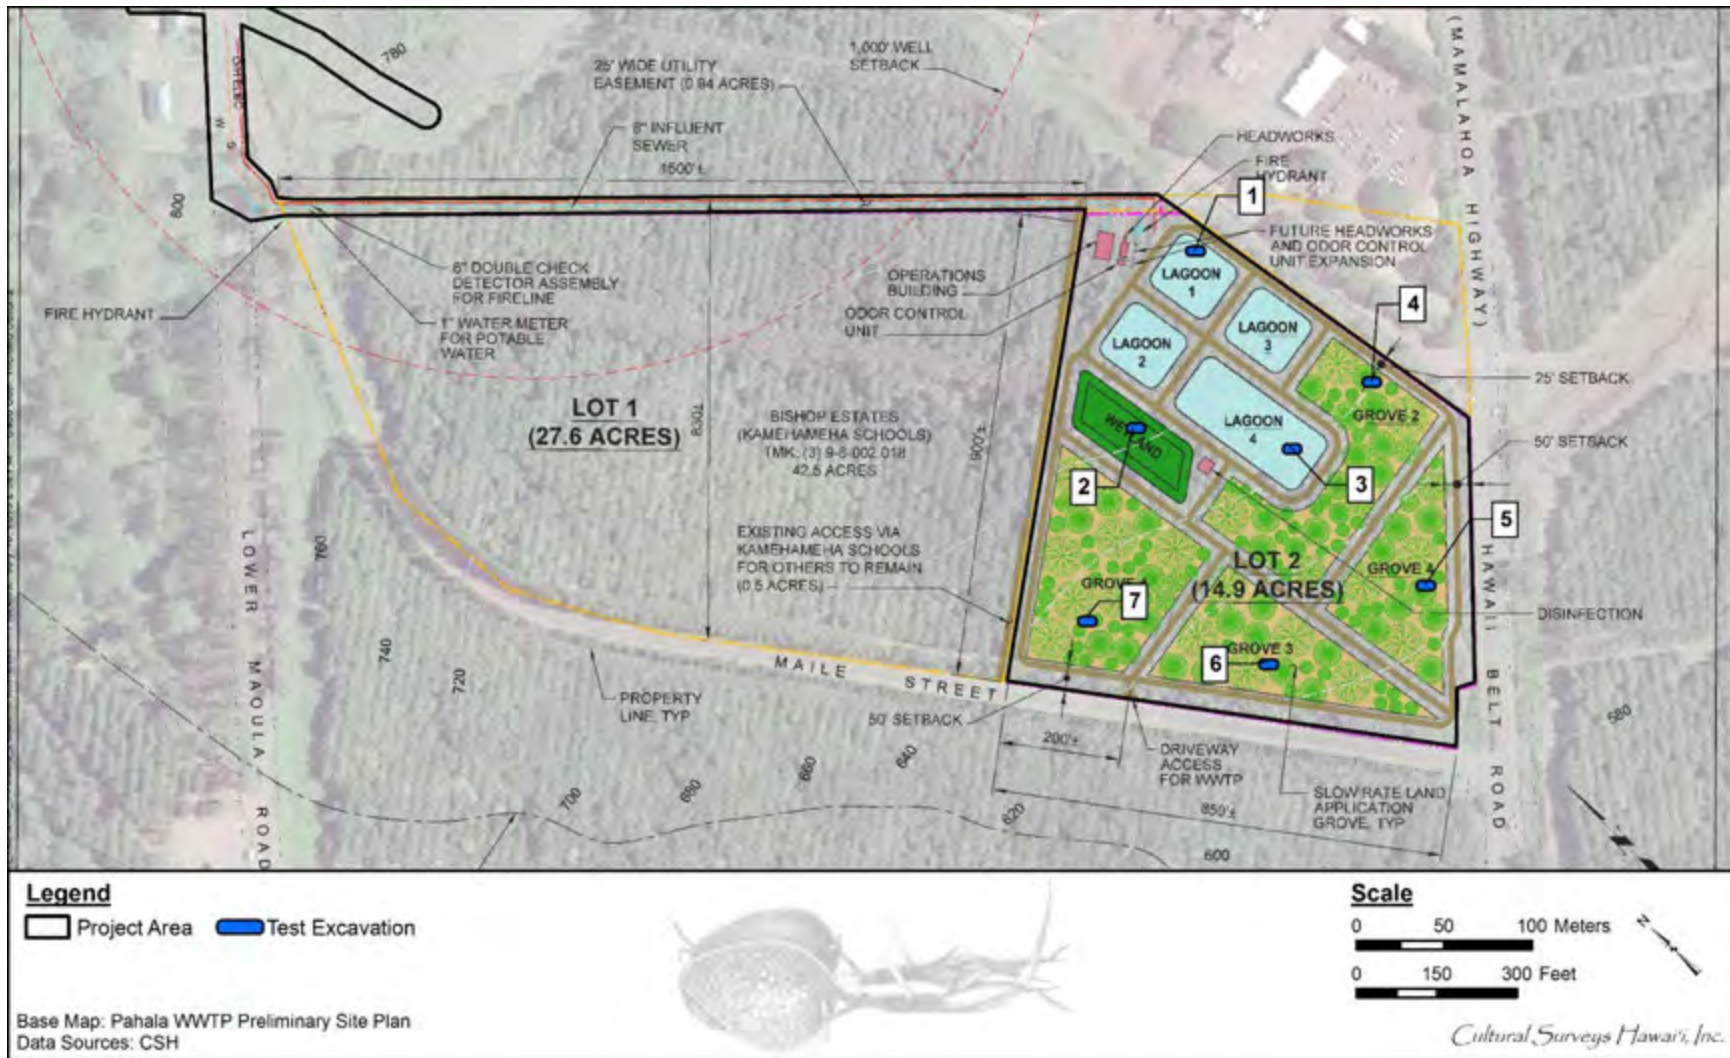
Preliminary WWTP site plan, overlain with locations of the seven test excavation trenches within the proposed WWTP site portion of the project area (TE 1 through TE 7) (site plan courtesy of client, with Google Earth 2013 overlay added)
